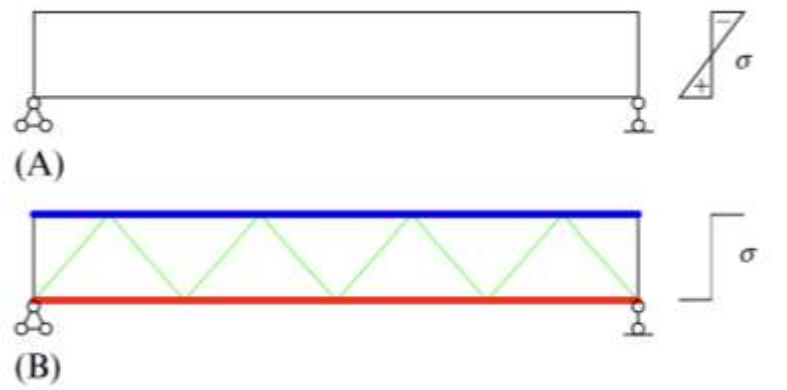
Truss and Beam Stresses Distribution. (a) Typical Girder, (b) Truss Girder
